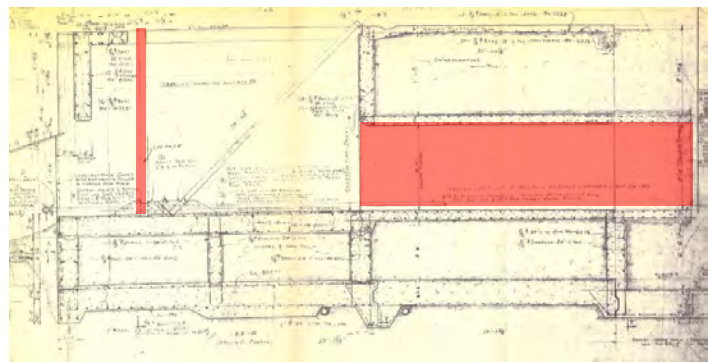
Penstock Intake and Penstock - Elevation Looking Left
